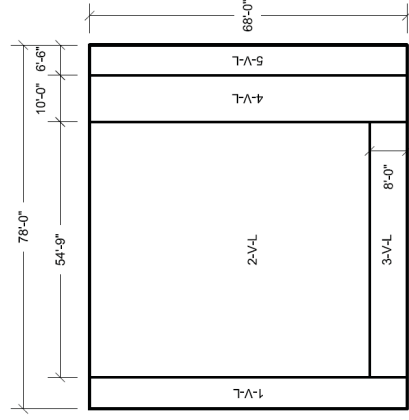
H-6-57: PUMP HOUSE WEST WALL LOOKING EAST
